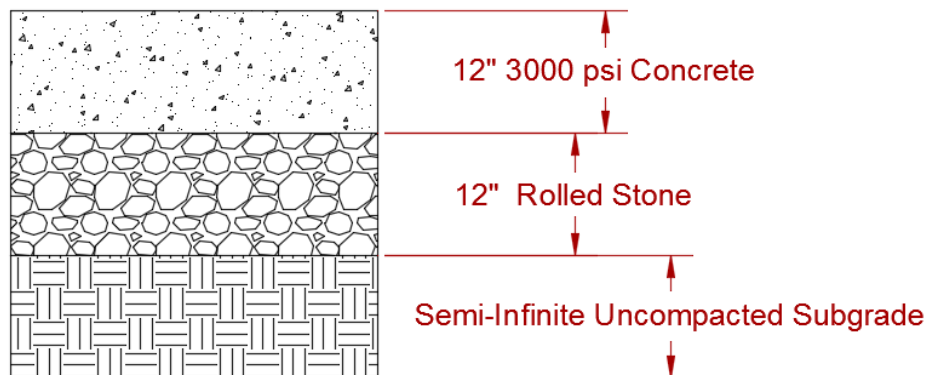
Concrete Apron Area Typical Cross Section
